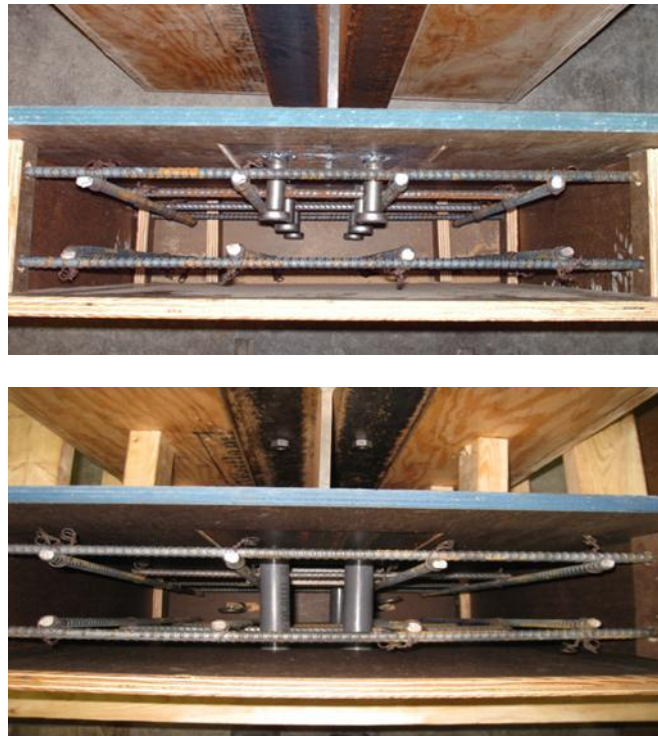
Reinforcement Details of Shear Stud (Top) and Shear Lug (Bottom) Specimens
